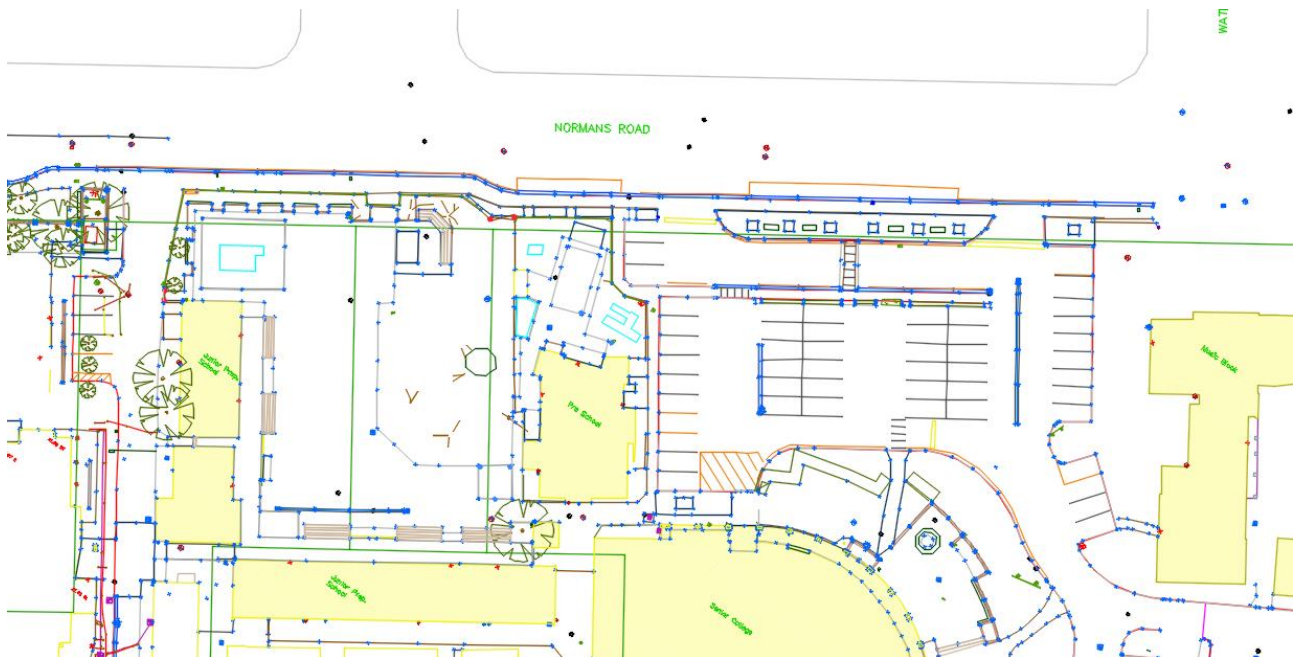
St Andrews College: Normans Road Car Park and Drop Off (Topographical Survey)
